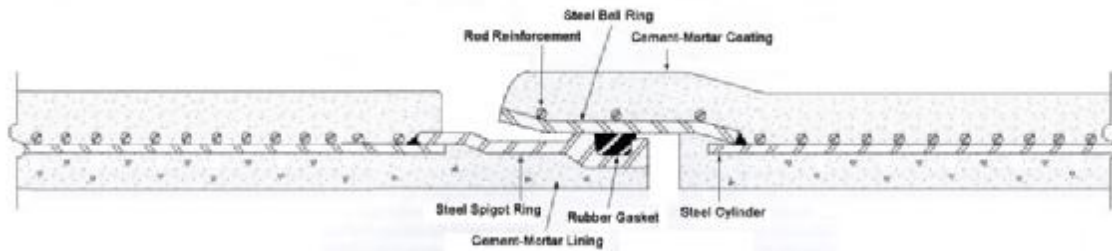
Cross-section of AWWA C303 Bar-wrapped Pipe Joint (not to scale)
